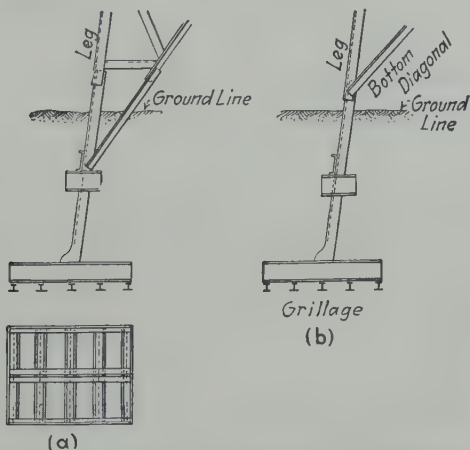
All-steel anchors for earth setting—American Bridge Company.
